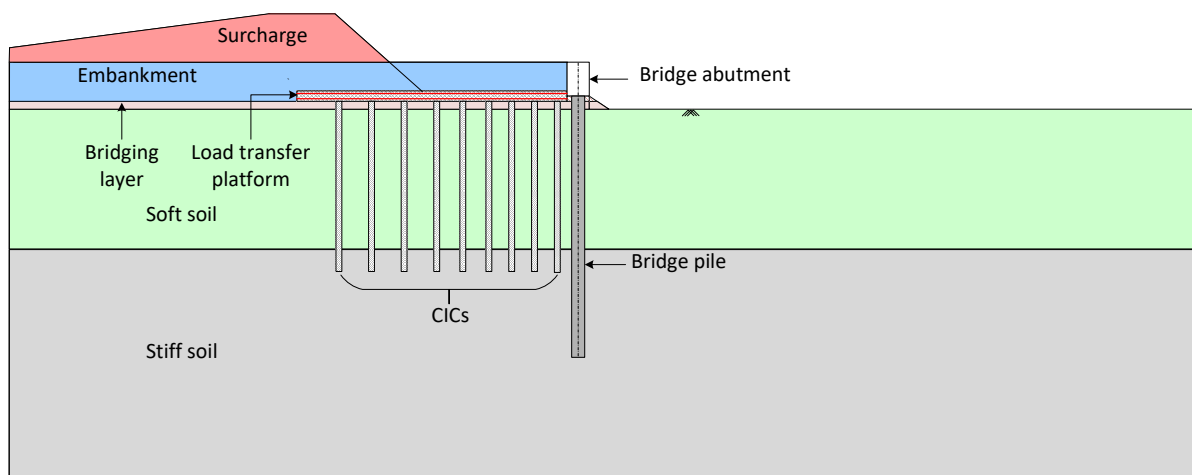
A schematic cross-sectional 2-D view of the CIC improved ground near the bridge abutment.
